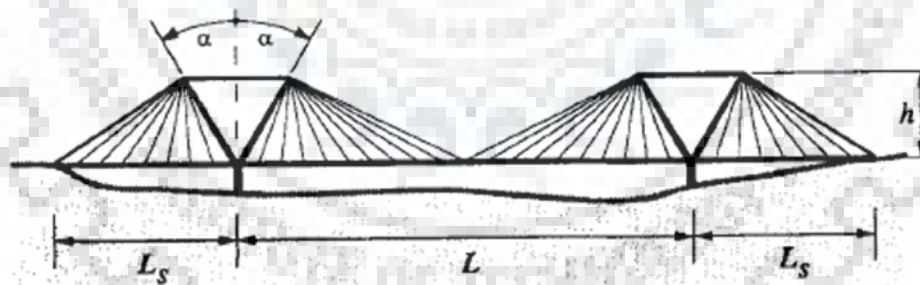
Spread pylon cable-stayed bridge (Starossek, 1996)
